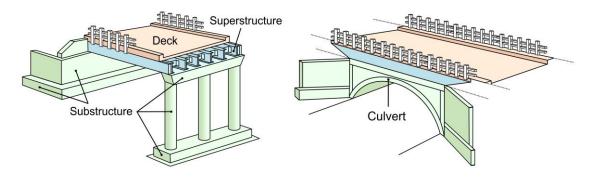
ANATOMY OF A BRIDGE OR CULVERT
